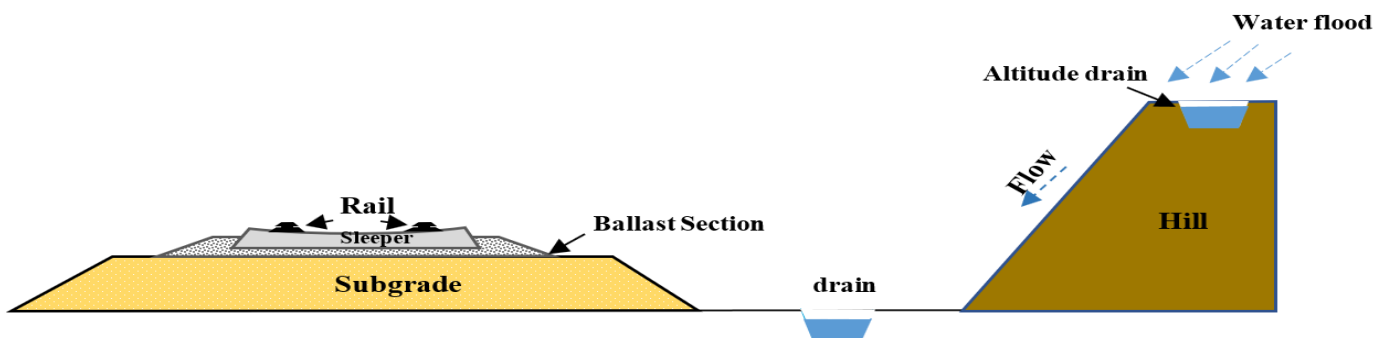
Schematic drawing of high – altitude drain to collect water flood before reaching the track.
